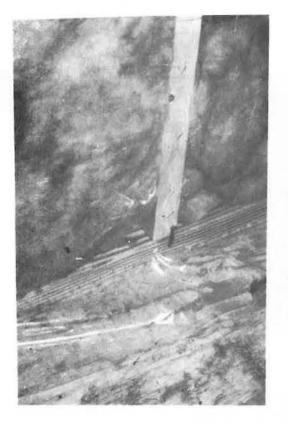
Sealing of sill with an open-cell foam strip, also used between construction elements. Note the air/vapor barrier's overlap into the floor.
